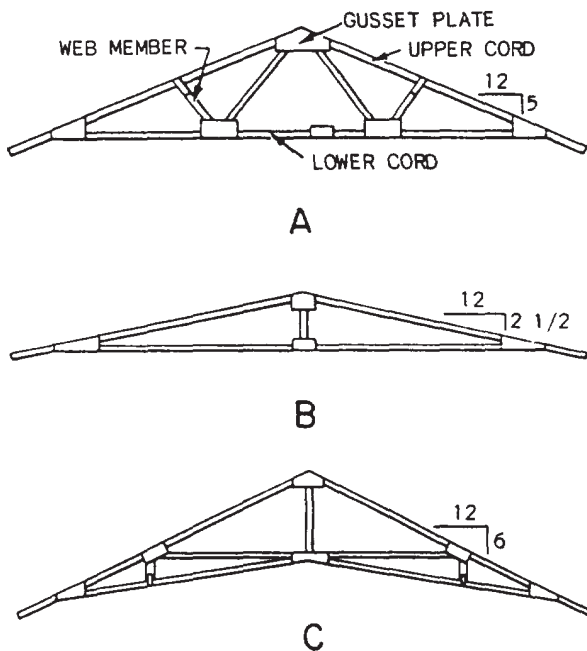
Light wood trusses: A. W-type; B. King post; C. Scissors.
